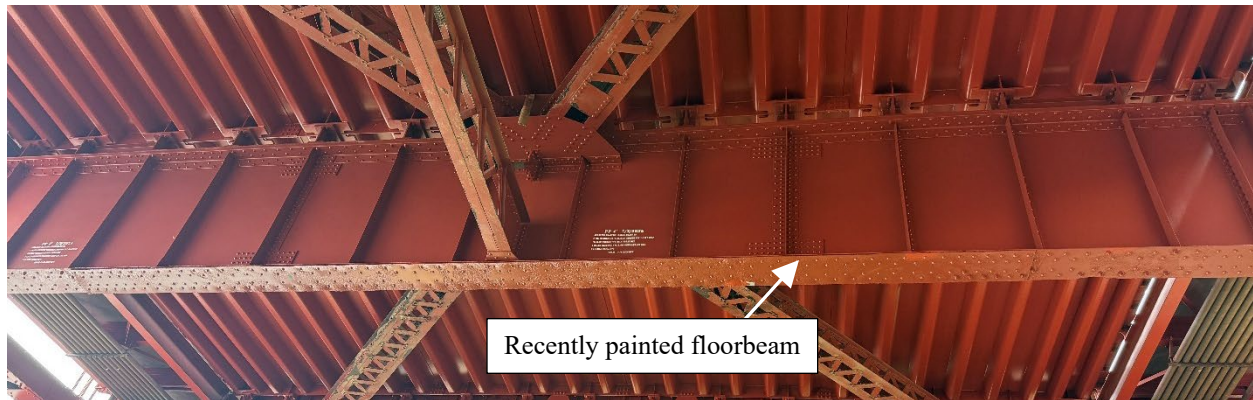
Floorbeam Painted by Bridge Paint Department in Span 4
